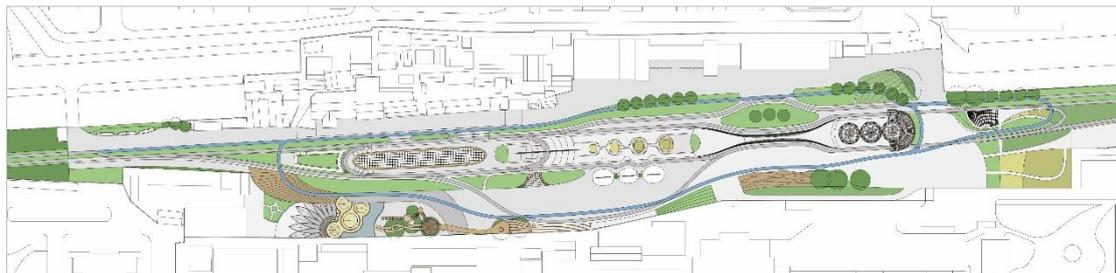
General plan of site landscape redesign (Photo source: Author's self-drawn)
